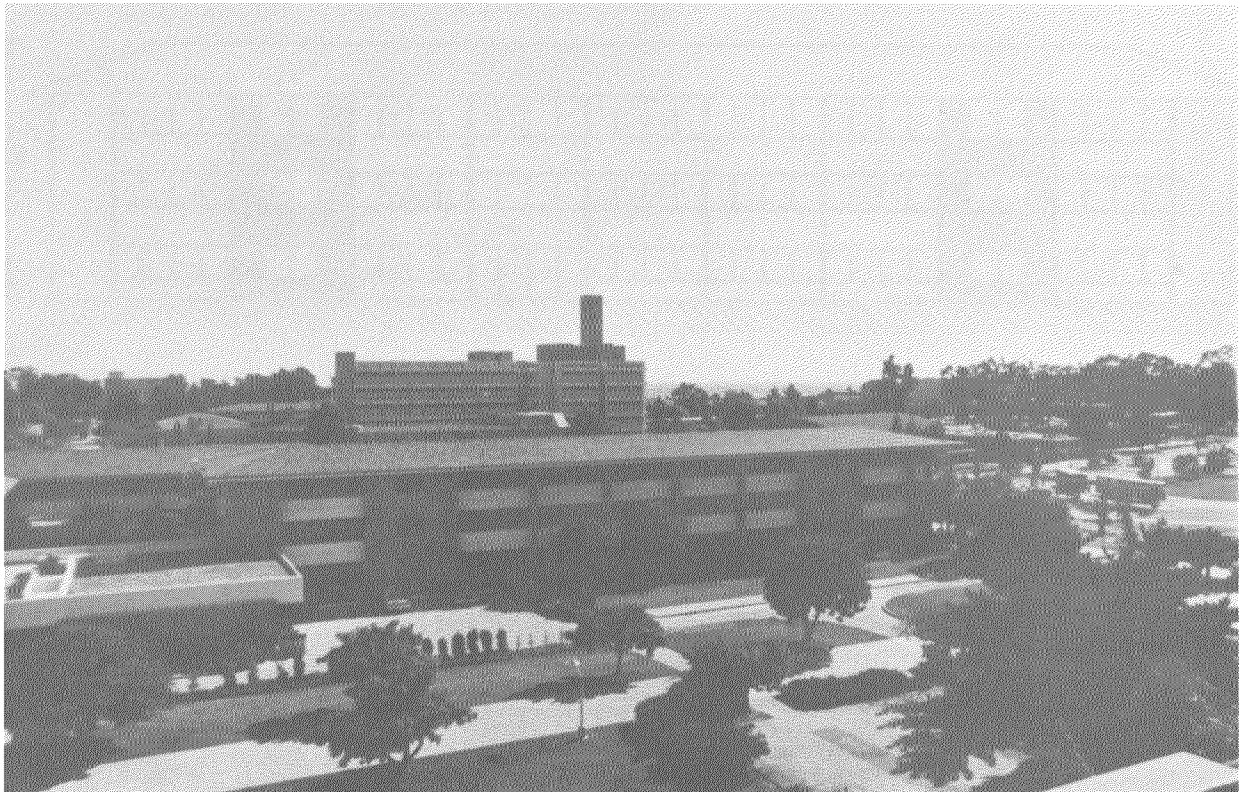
East-west elevation of North Hall, UCSB, showing the east-west shear walls constructed during rehabilitation in 1976.
